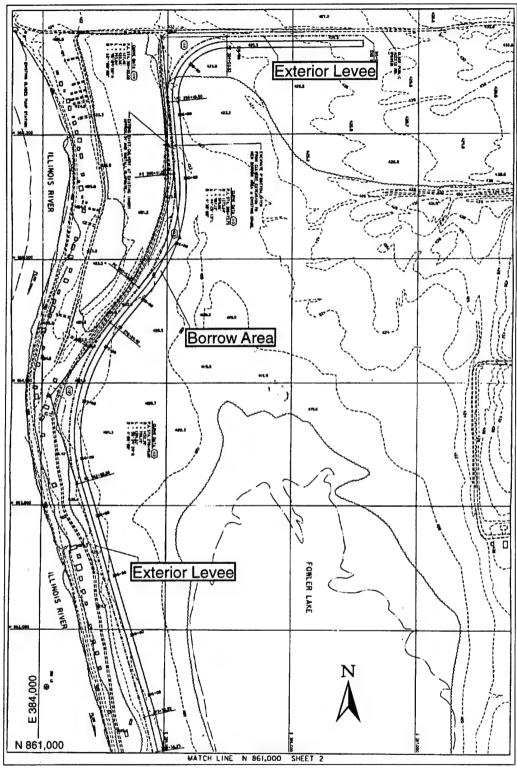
Stump Lake Complex HREP/EMP project area plan, N861,000-867,000.
